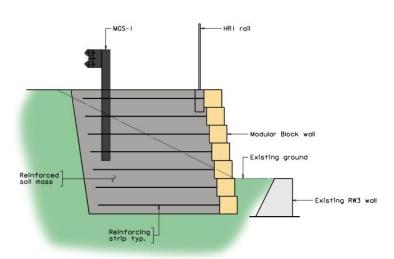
Block Wall near Russell Branch Parkway
